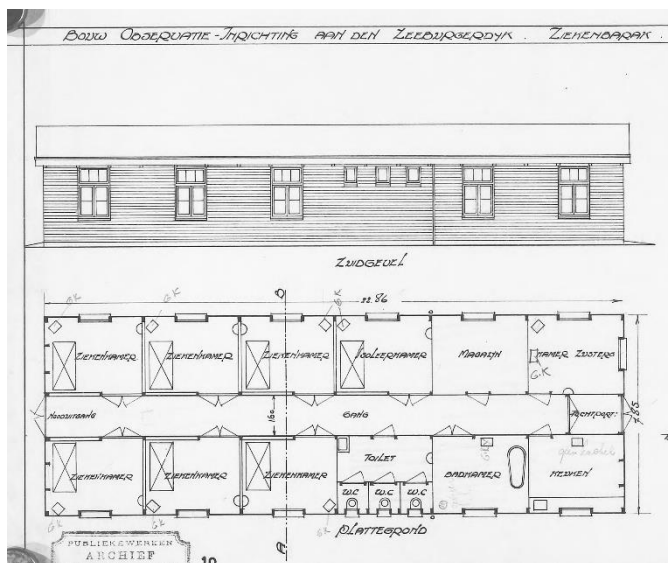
Floor plan of a barracks at Quarantine Station Zeeburgerdijk (Stadsarchief Amsterdam)
